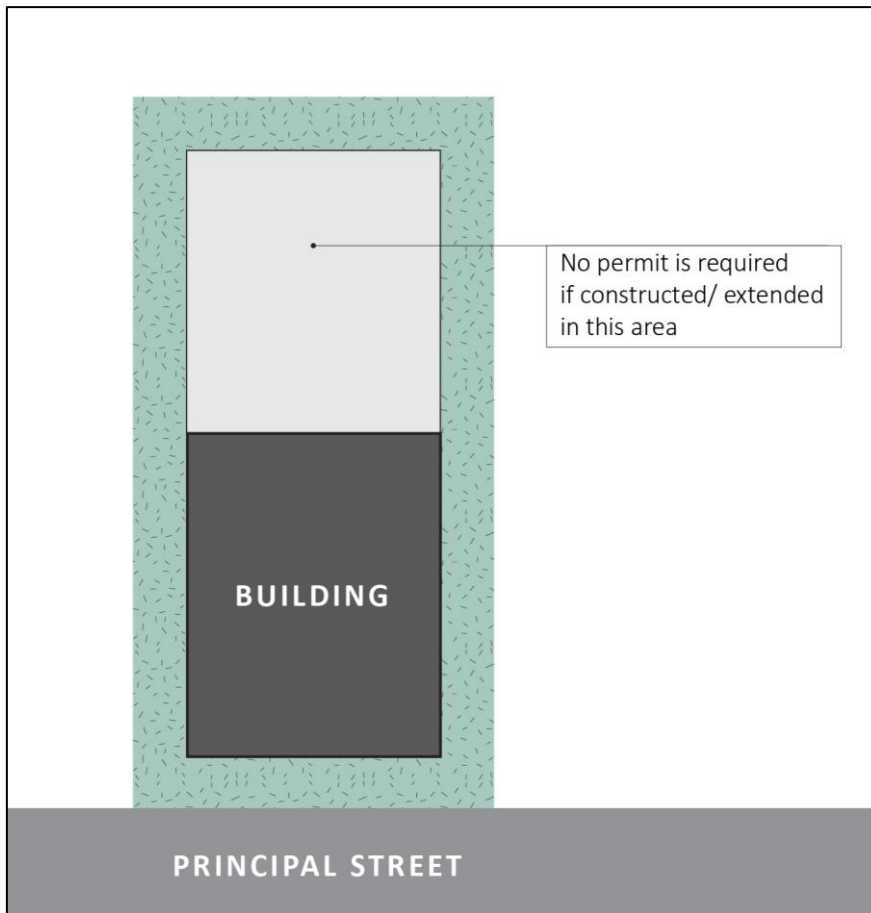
Construction of a single-storey addition or extension to an existing building is exempt if located in this area
